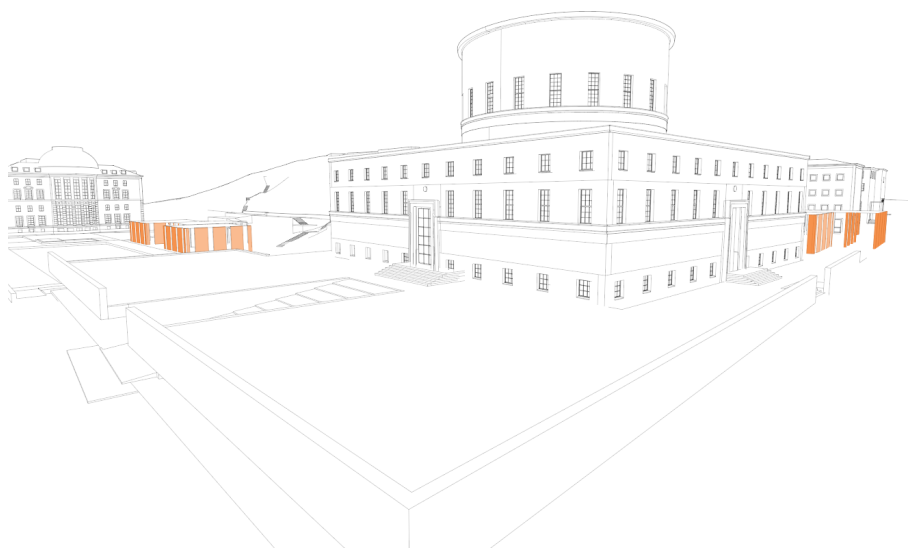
Library and the pavilion infrastructure reinforcing its relation to the surrounding
